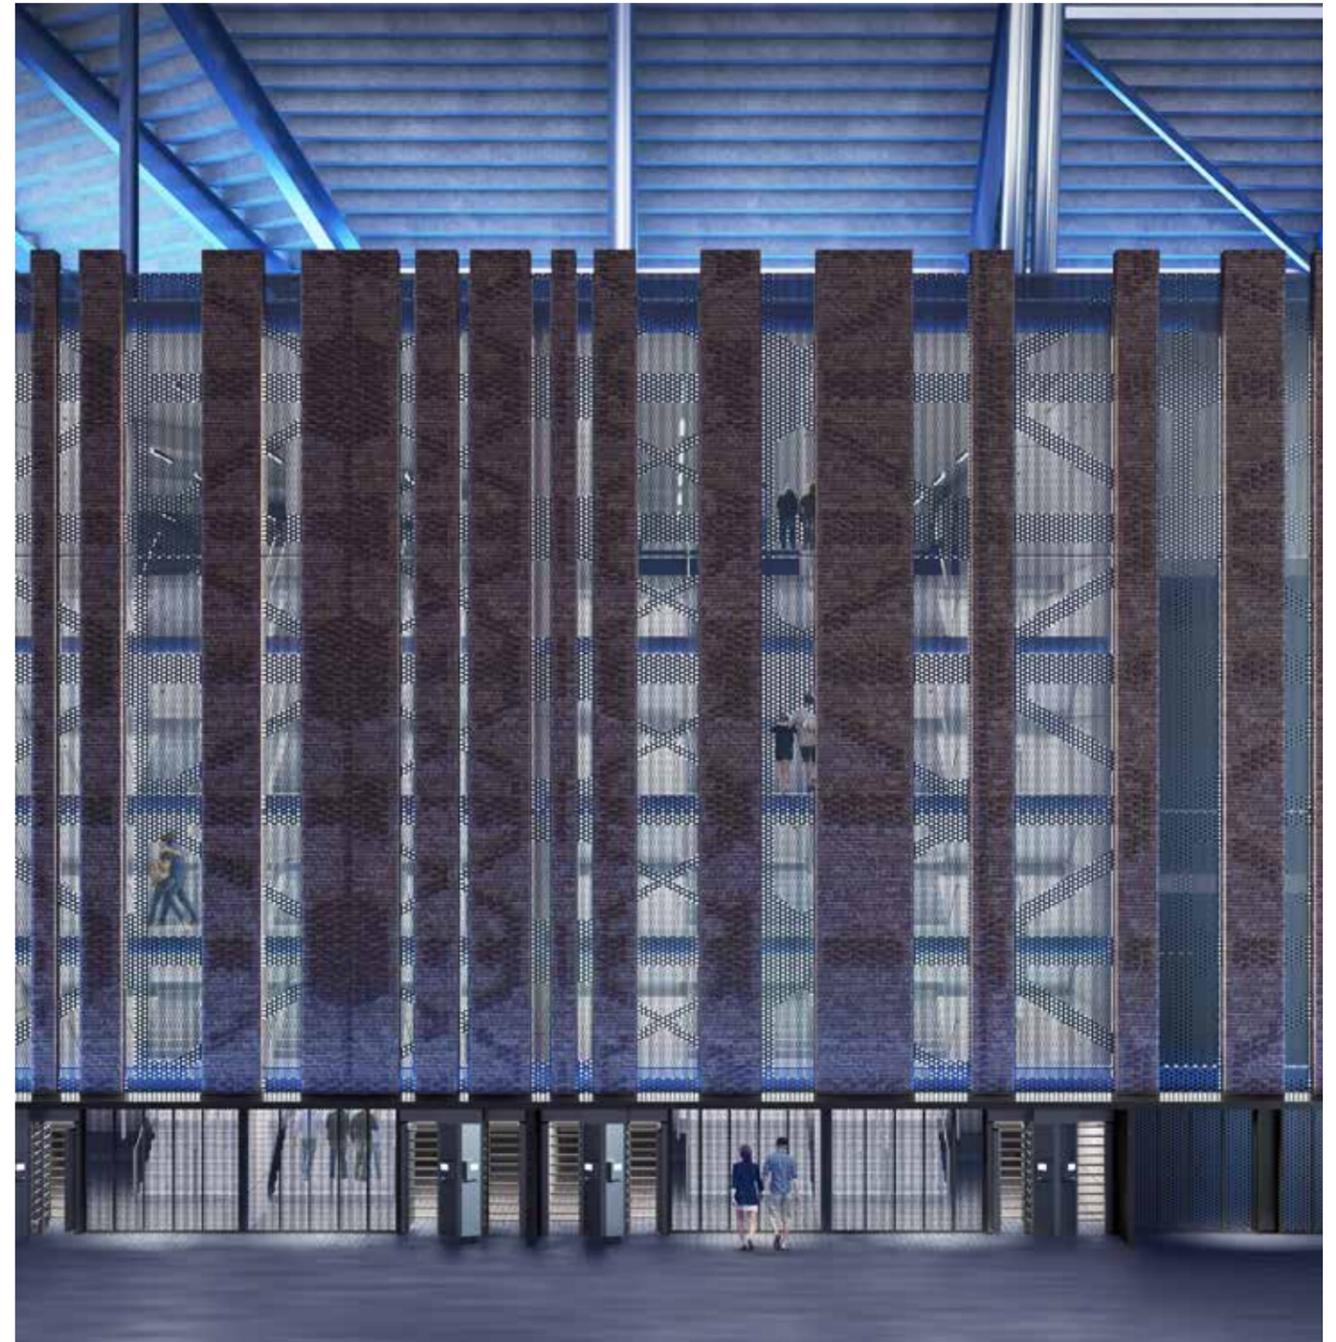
East facade elevation detail illustrating a nighttime lighting scenario
